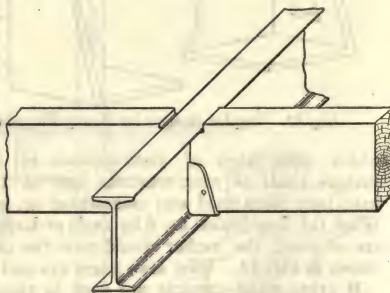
Wooden Beam Framed to I Beam with Duplex Hanger
